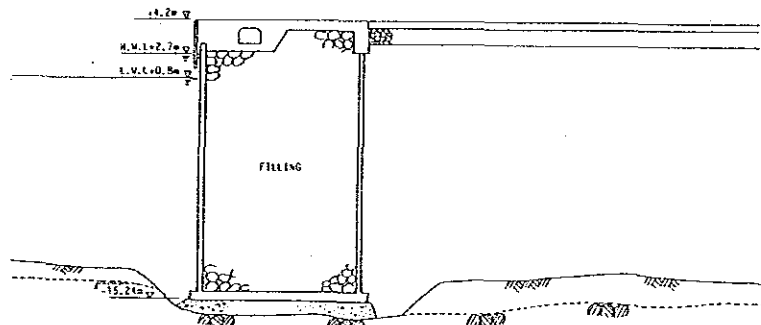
(1) Existing Quay Wall (Berth No.1A)
